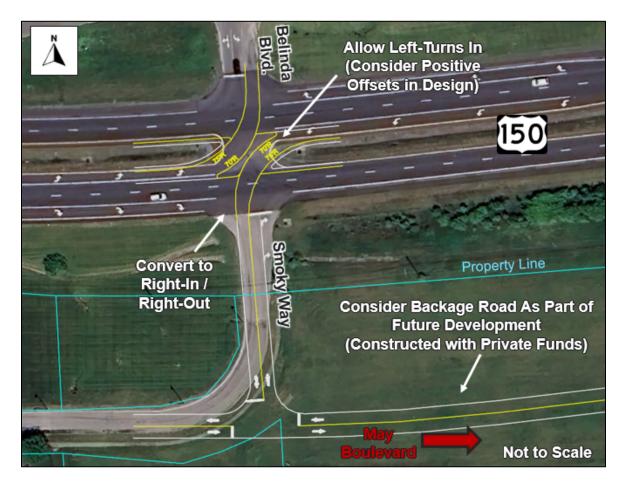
South Danville Bypass at Belinda Boulevard / Smoky Way
